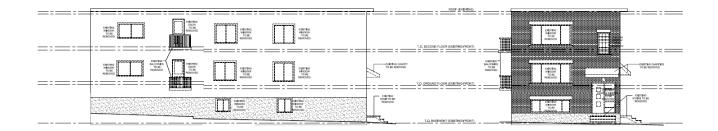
Building elevations of north (left image) and front west (right image) side of building, prior to the renovations.
